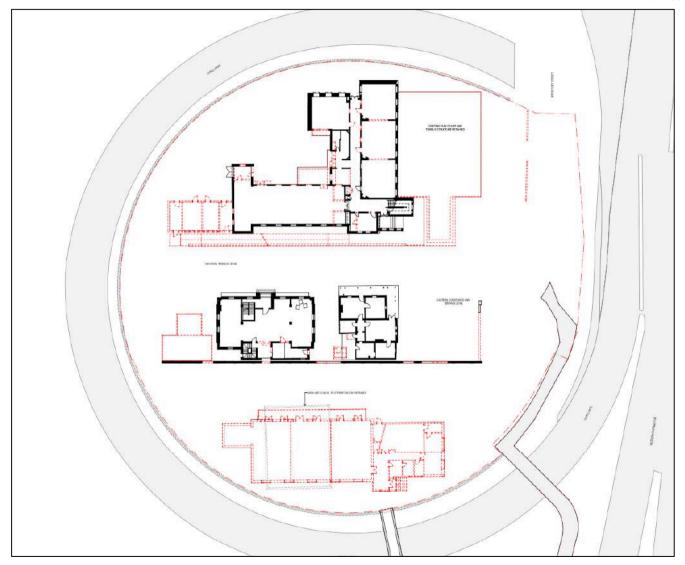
Demolition Plan – Ground Floor (Source: FJMT Studio, DWG DA-2101, 18.12.2019)
